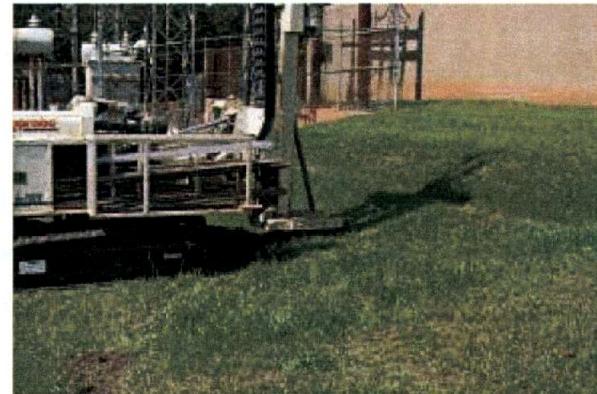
Soil boring installation at B-6, 280 National Avenue.
